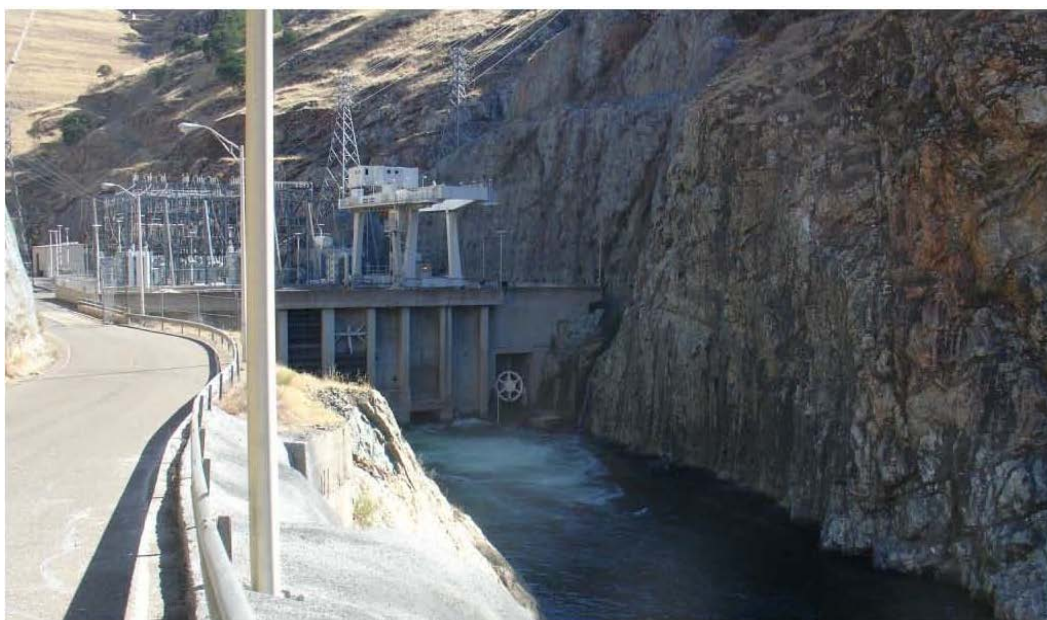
Don Pedro powerhouse and hollow jet valve viewed from tailwater.
